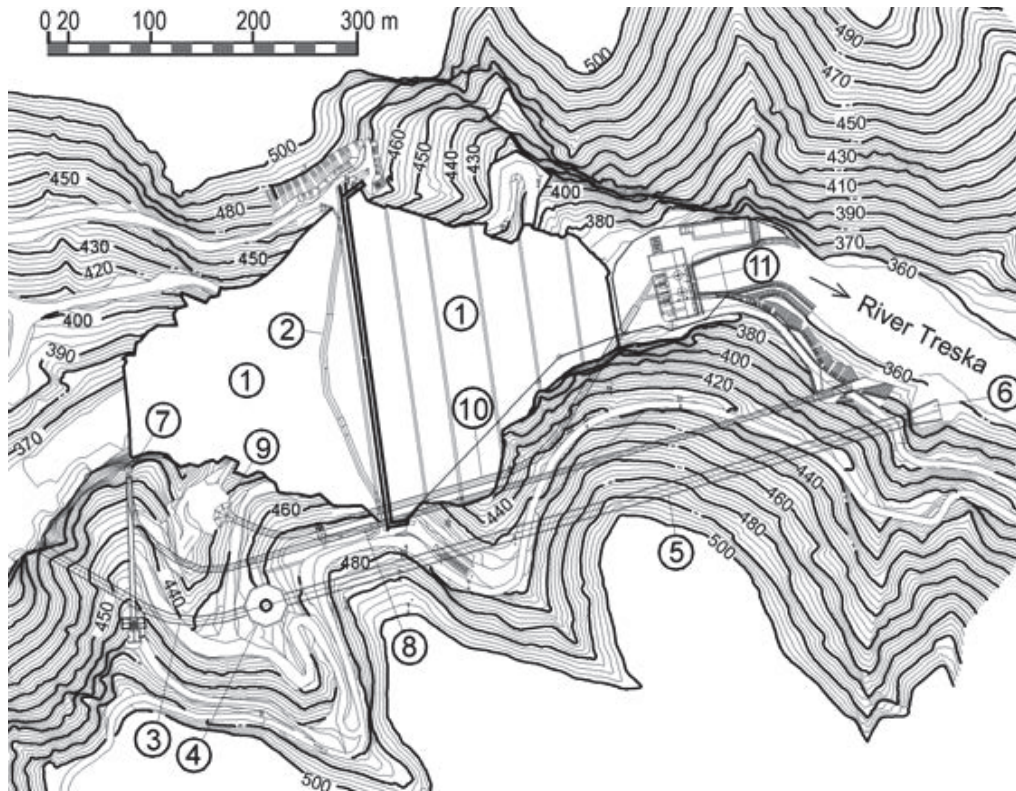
Layout of the hydraulic scheme with Kozjak Dam. (1) Dam body; (2) grouting gallery; (3) diversion tunnel; (4) morning glory (shaft) spillway; (5) spillway tunnel; (6) flip bucket; (7) intake structure of the bottom outlet; (8) bottom outlet tunnel; (9) intake structure of the power plant; (10) water supply tunnel for the power plant; (11) tail raise channel.
